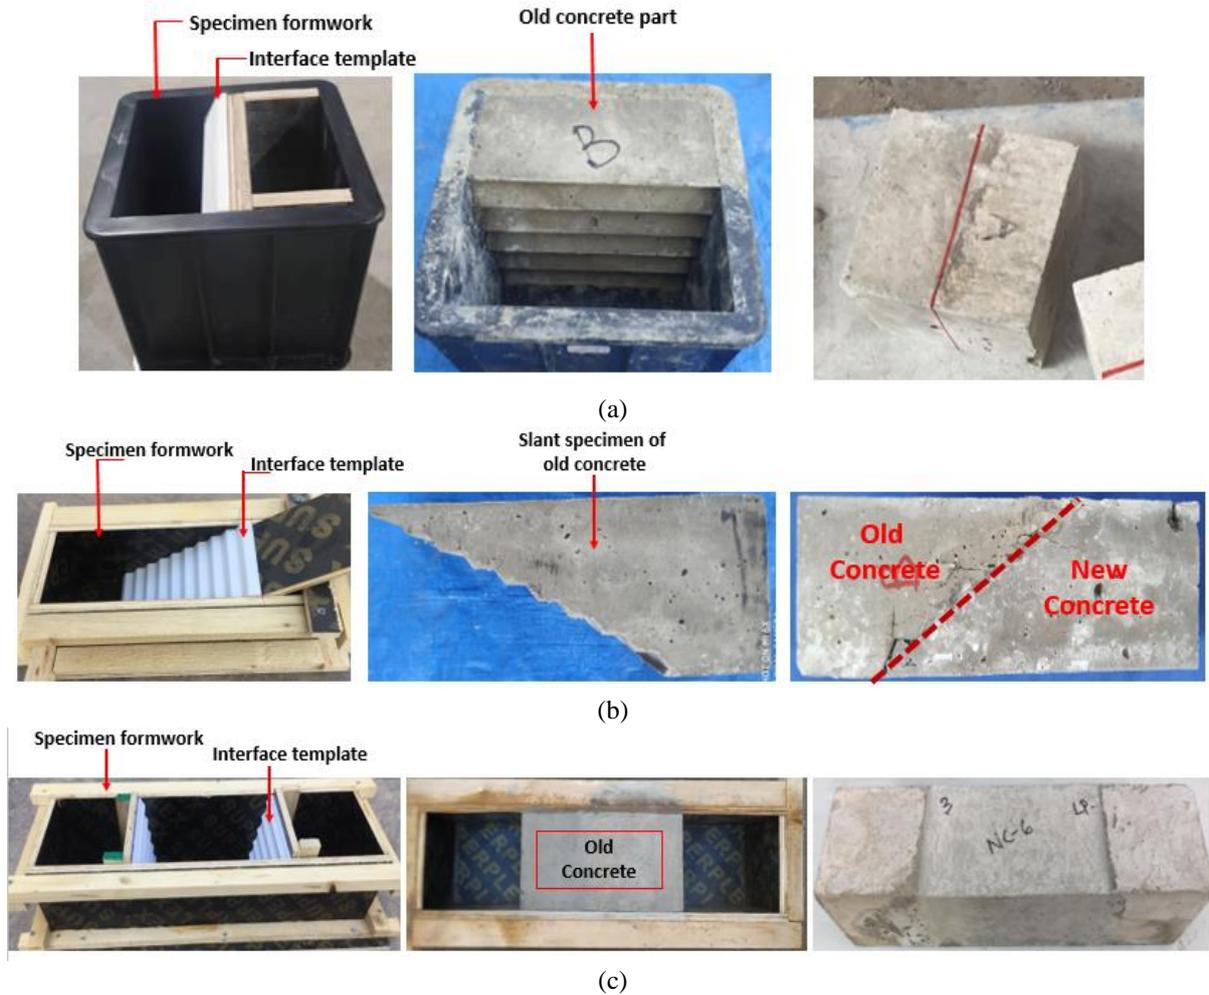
Fabrication of test specimens (a) Splitting tensile specimen (b) Slant shear specimen (c) Double-shear specimen
